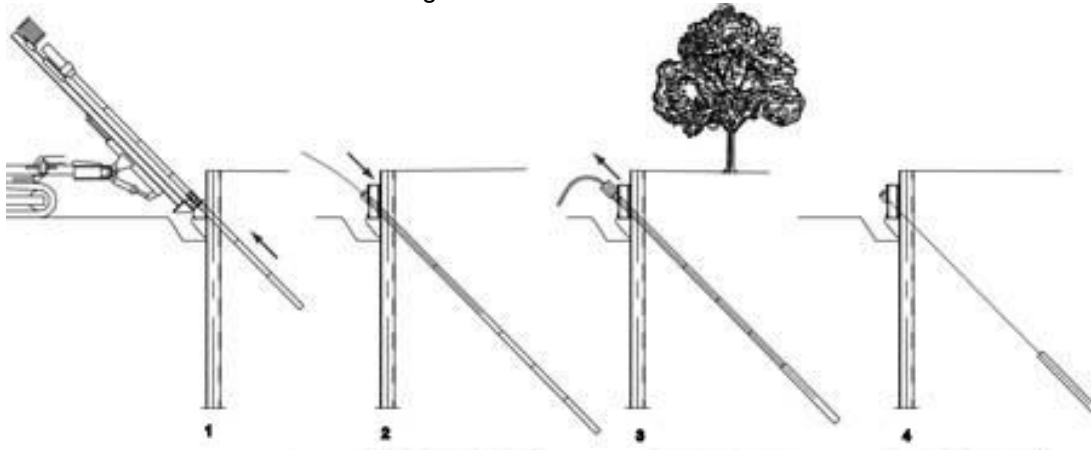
Installation of a grout anchor (Funderingstechnieken BAM Infra, 2020)
